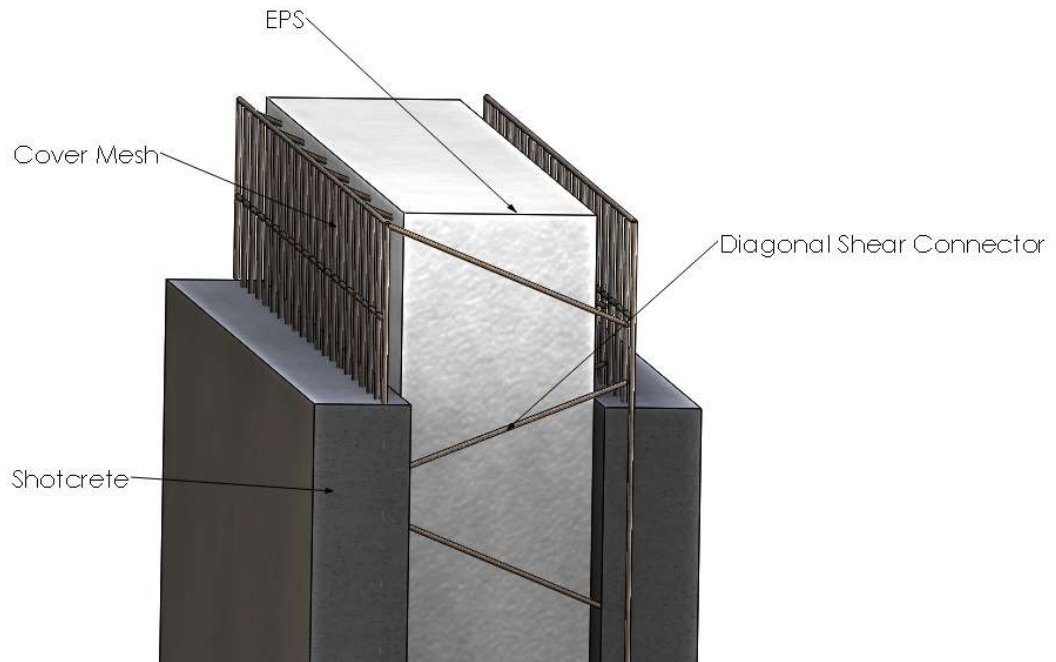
Typical CSP Cross Section designed with Diagonal Shear Connectors
